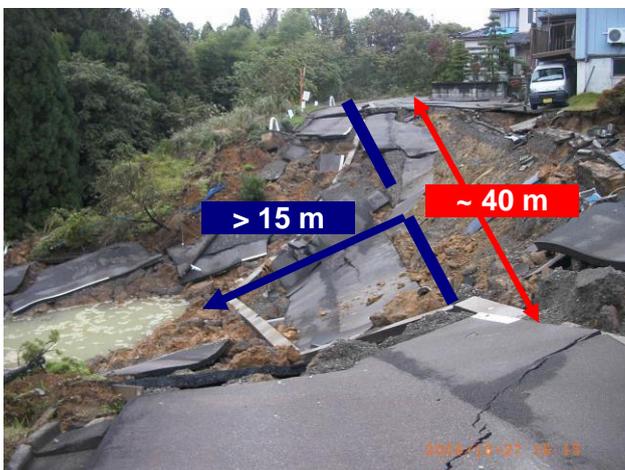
& 2-4 Several landslides took place in Takamachi residential area. Large cracks were formed due to soil movement within this area, varied from tens of centimeters to more than one meter. Roads and pipe lines were heavily damaged.
